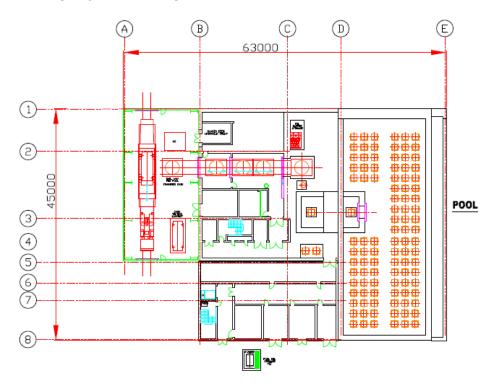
WET STORAGE FACILITY PLAN VIEW
